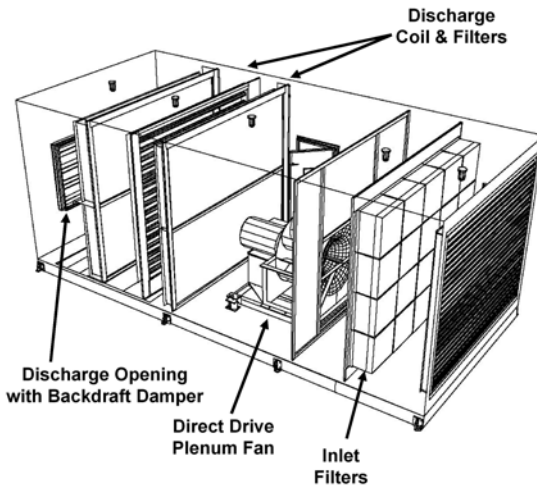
Cutaway sketch of a plenum fan air-handling unit.
